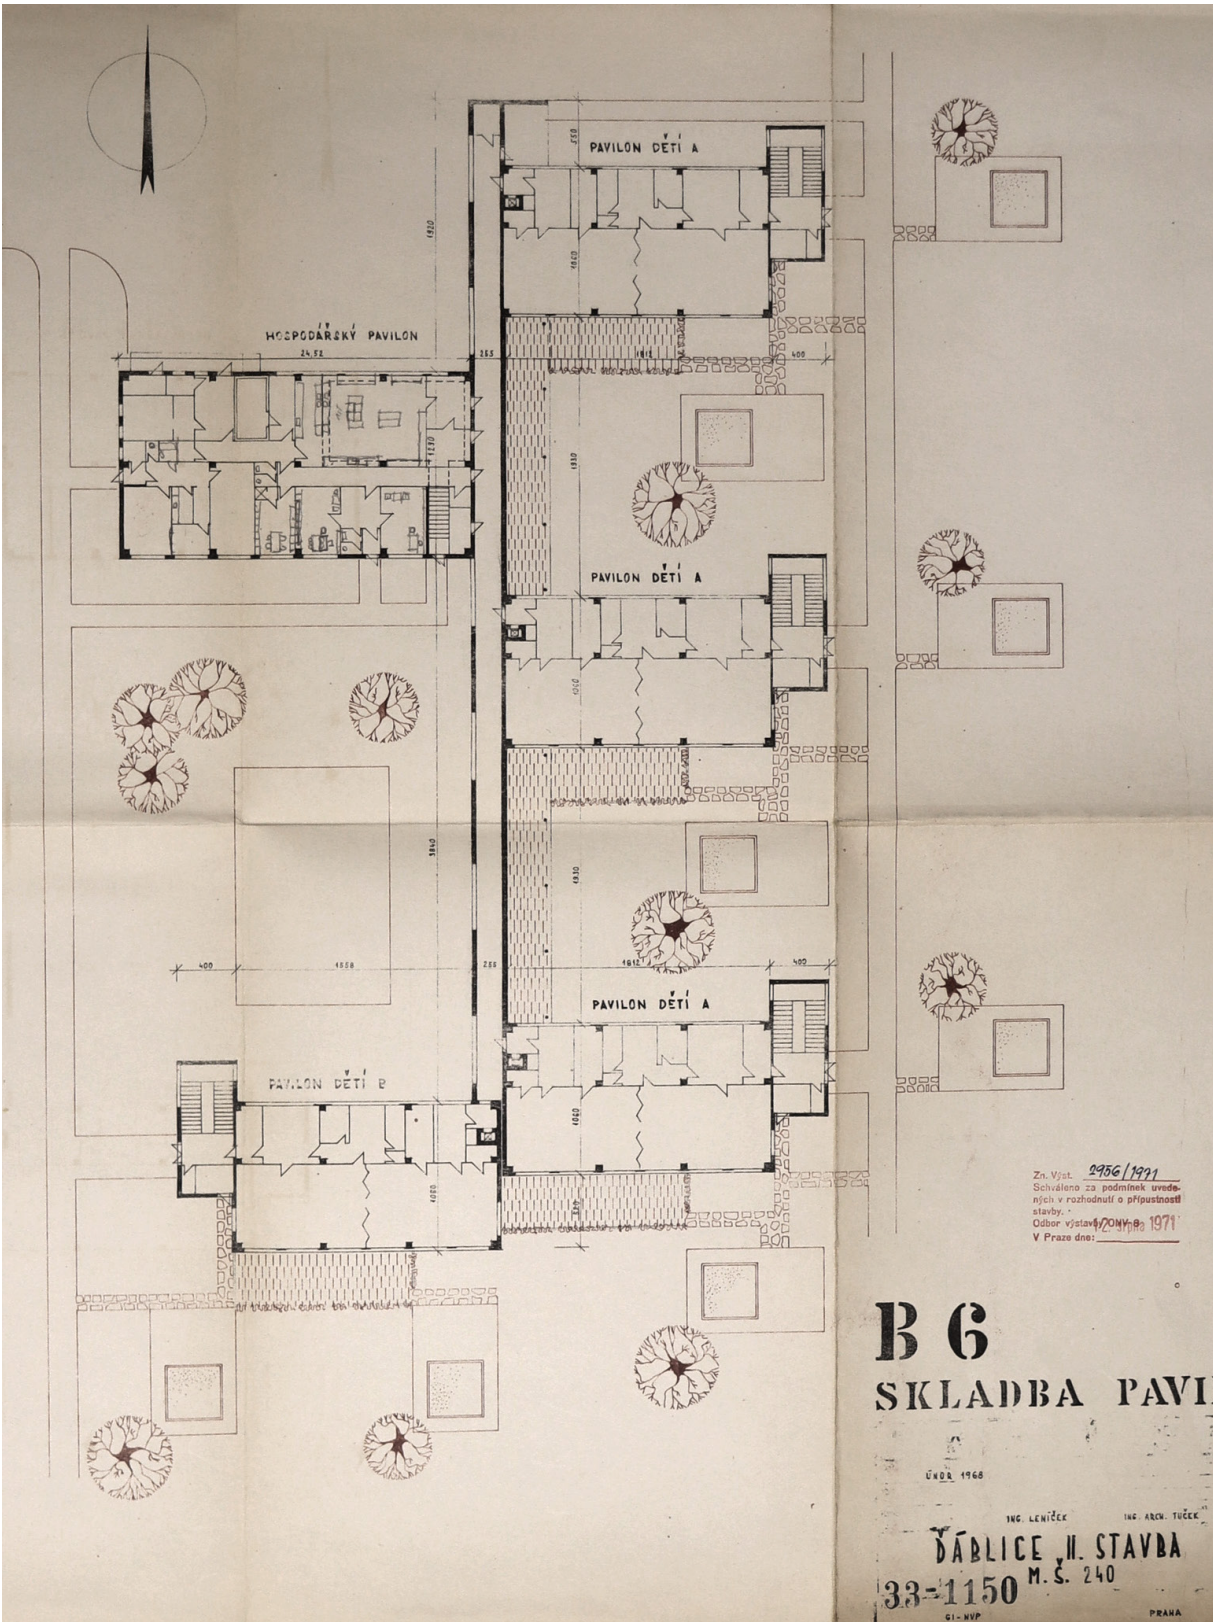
| Existing kindergarten project (Kindergarten Floor Plan, 1968)
